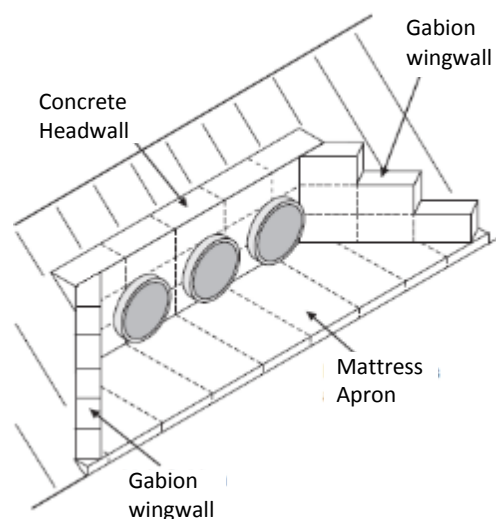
Typical Use of Gabions for Stormwater outlets (Adapted from p 26 Global Synthetic nd)
